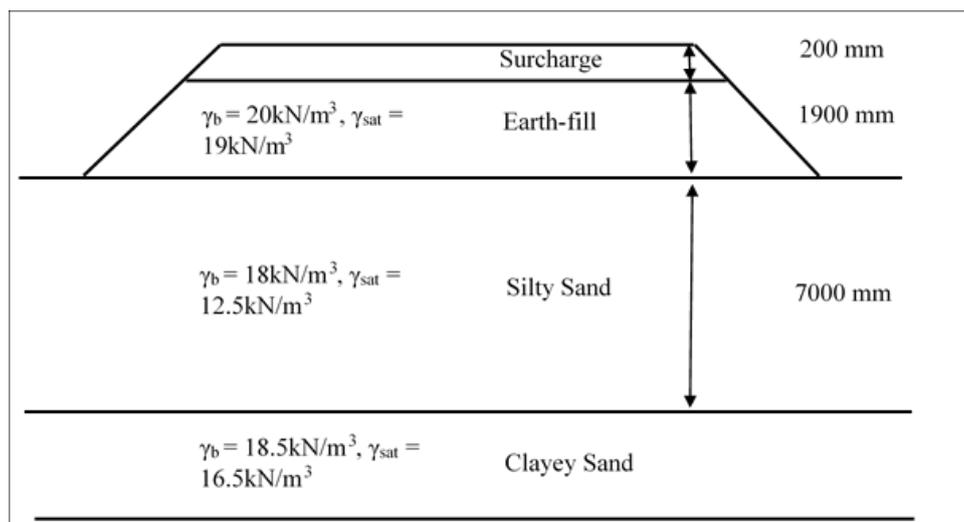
Cross-section of Embankment with Subsoil Profile
